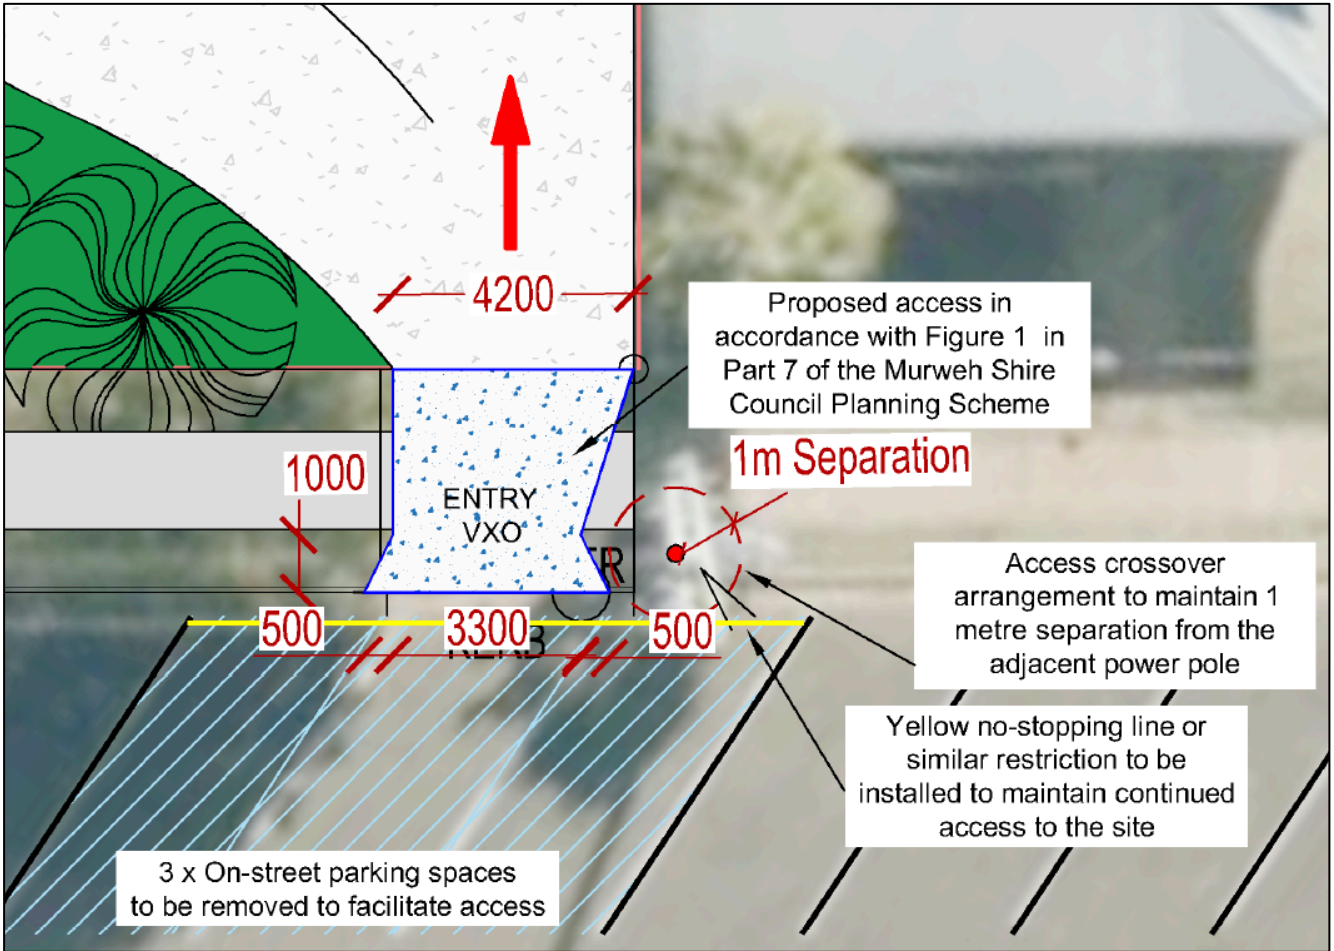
DETAIL A - Detailed Galatea Street entry crossover design
